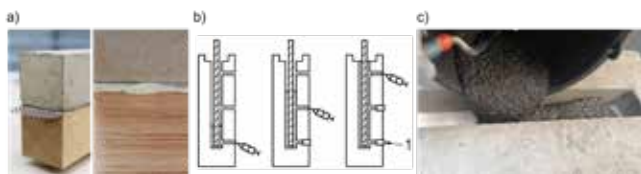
The application methods: a) hot bonding with expanded metal mesh, b) injection/filling of adhesive using the example of a threaded rod (1 = wooden dowel) [DIN EN 17334, Annex B], c) casting. © TU Braunschweig ifs, Univ. Kassel FBH
